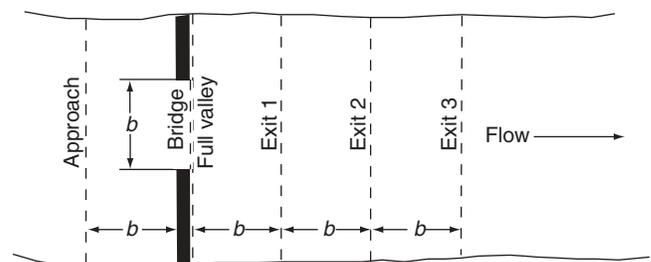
Plan view showing approach, bridge, full-valley, and exit cross sections used in water-surface-profile computational model WSPRO. b , bridge length.
